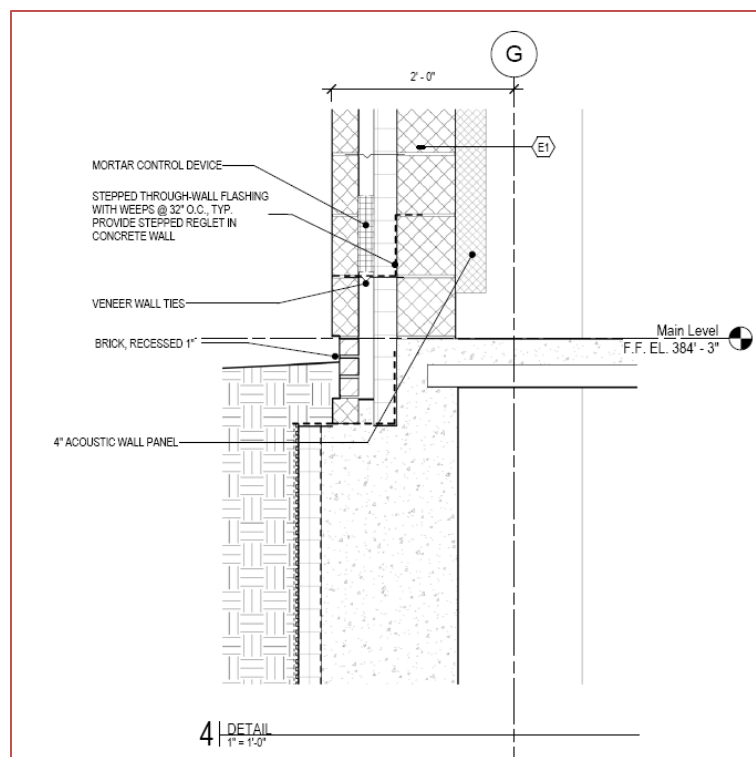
BRICK VENEER CONNECTION DETAIL
